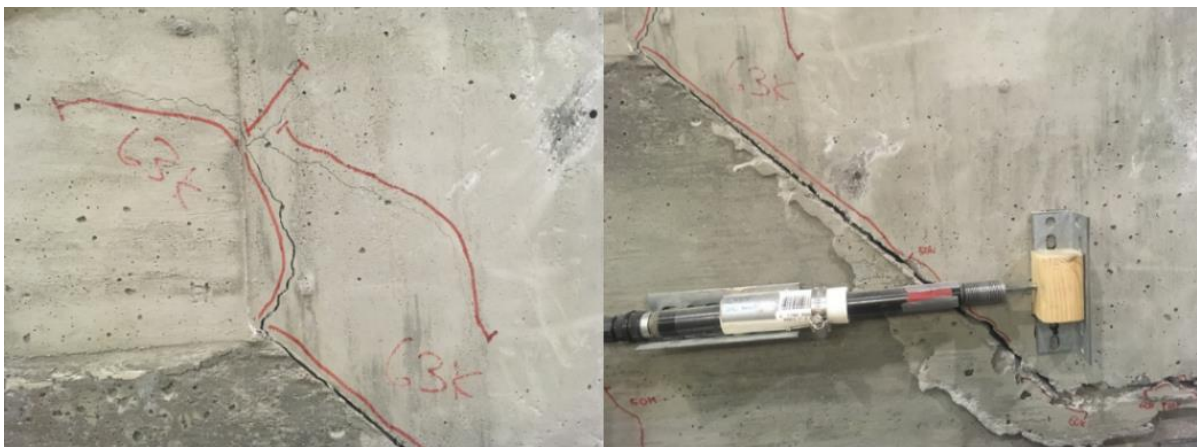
No Connection Detail with Poor Roughening Specimen Cracking at Failure Load of 63 kips (crack at top of web left and crack at interface right)
